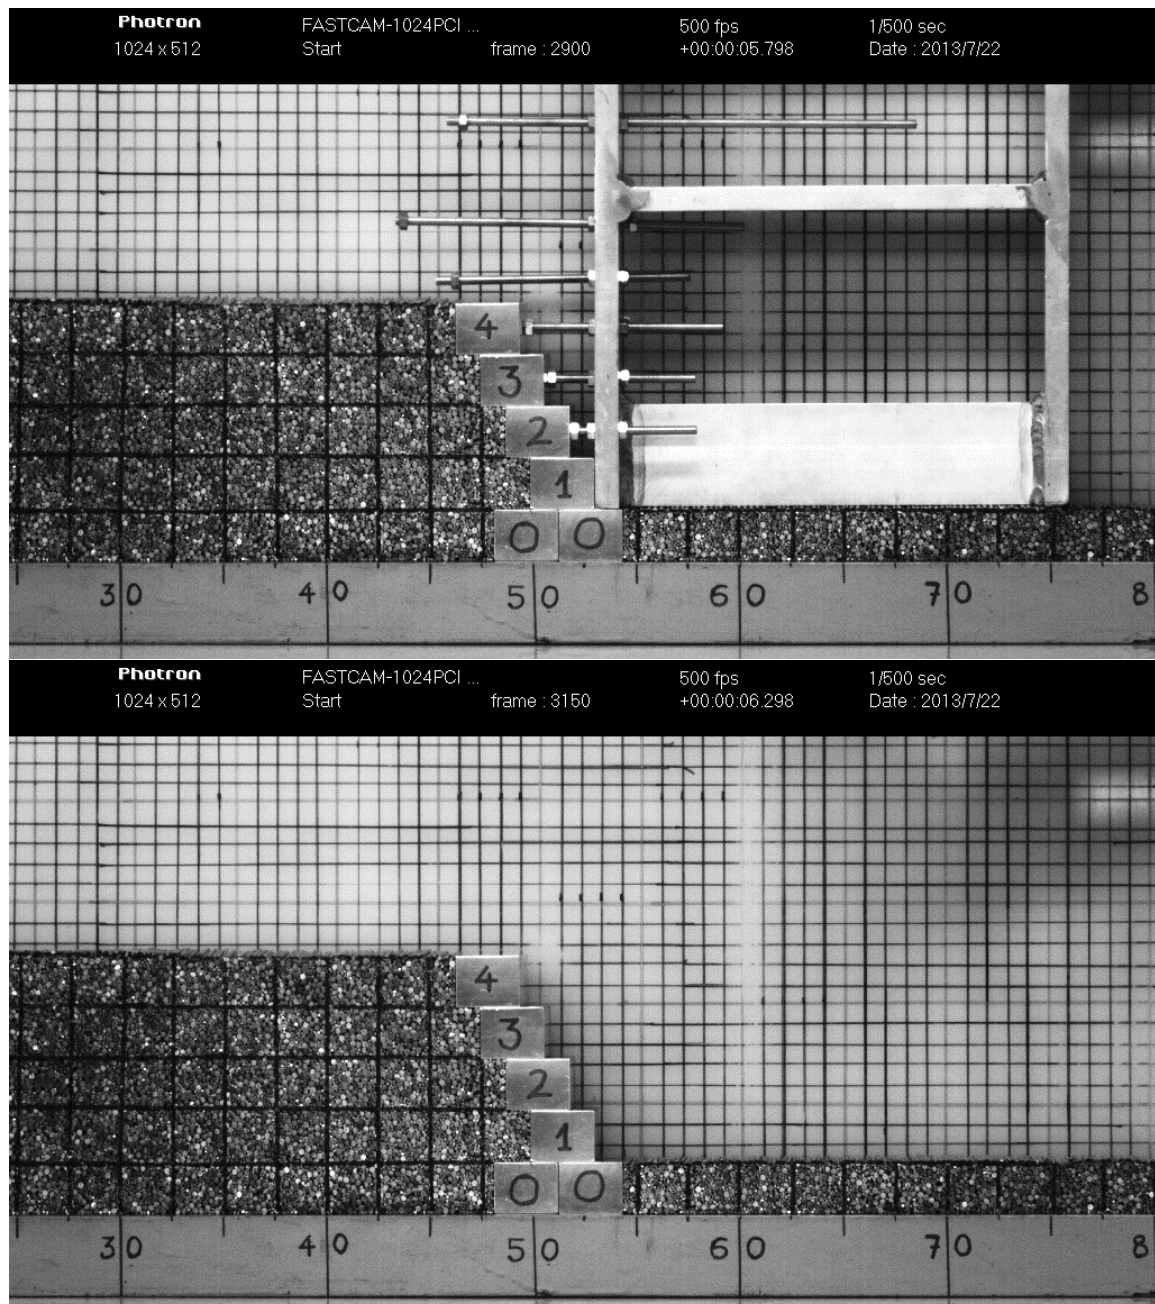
Post-failure behavior of modular-block retaining wall system. Case 3
